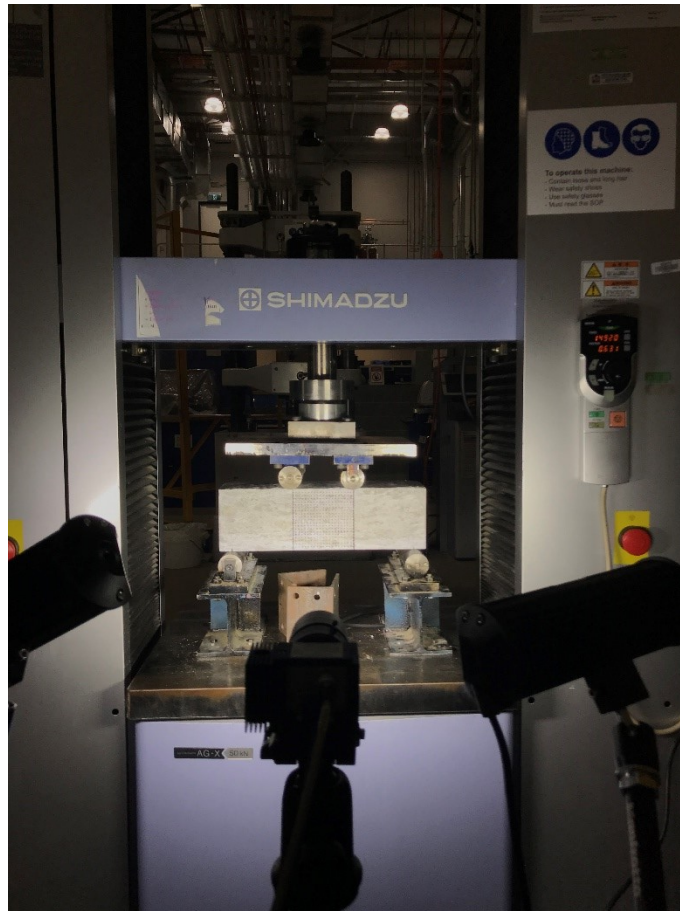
10 Testing of reinforced concrete beams under four-point loading with 2D-DIC system
